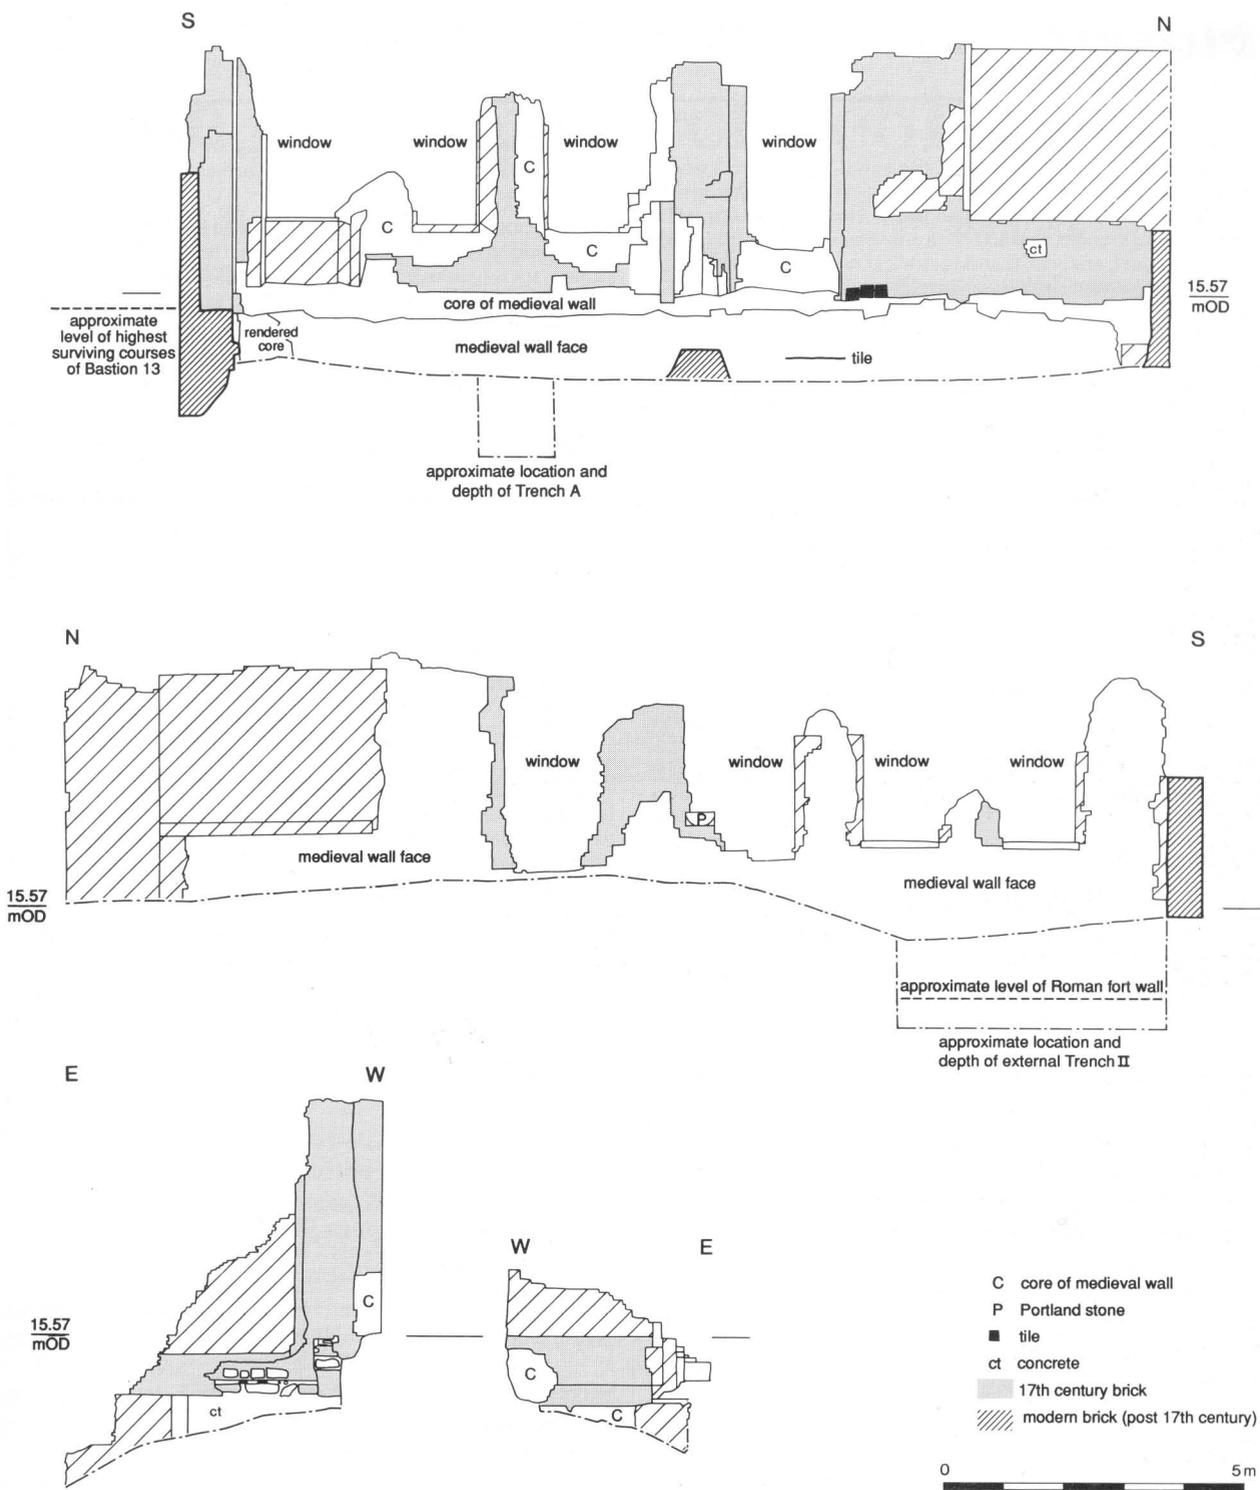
(upper) external elevation (west-facing) of Barber Surgeons' Hall.
